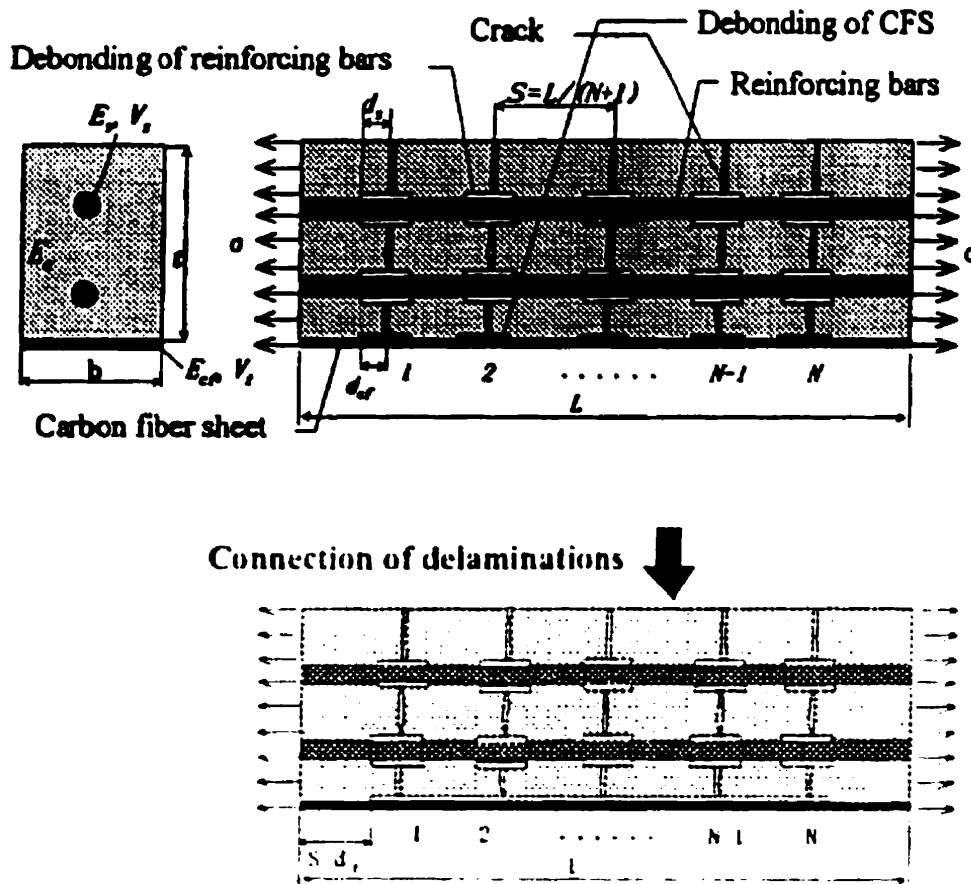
RC member bonded with CFRP sheet: general representation and connection of delamination between FRP and concrete [adapted from 61]
